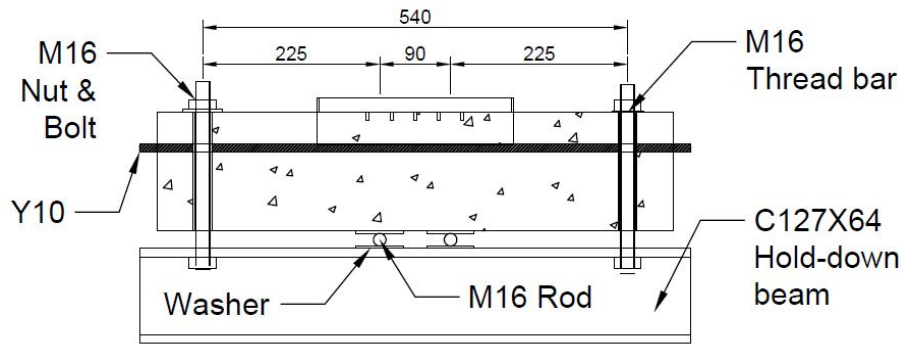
Schematic of 4-point loading rig (dimensions in mm)
